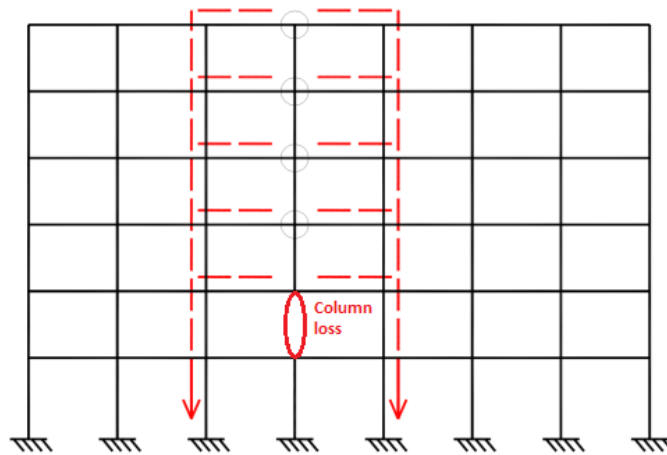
Alternative load path method (Demonceau and Dewals, 2020).
